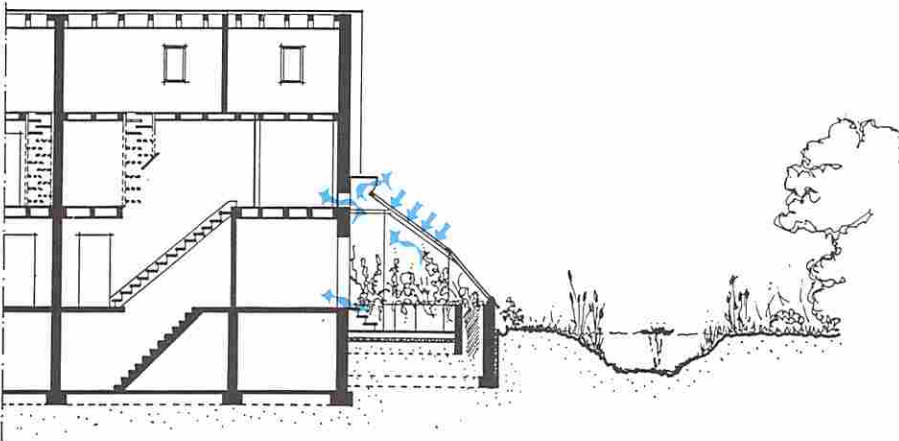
Section through south greenhouse and reflecting pond of Phase 1 Building
